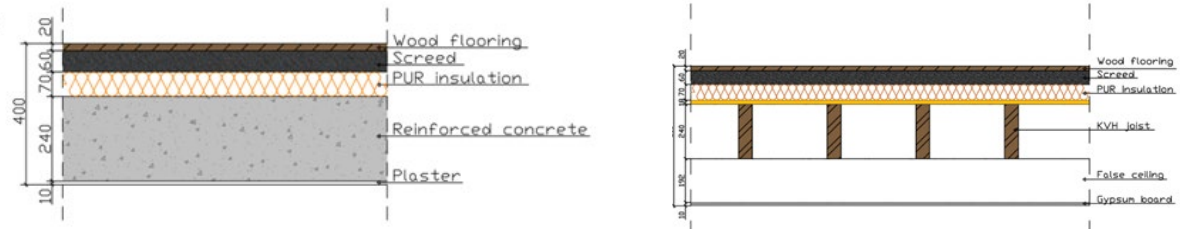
Section view of the slab of the concrete (left) and timber (right) buildings.
